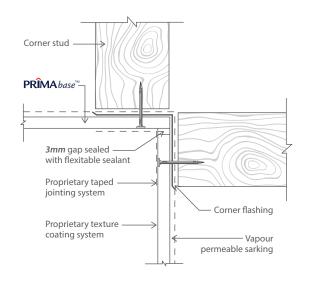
Internal Corner (Tape Reinforced Flexible Joint)
